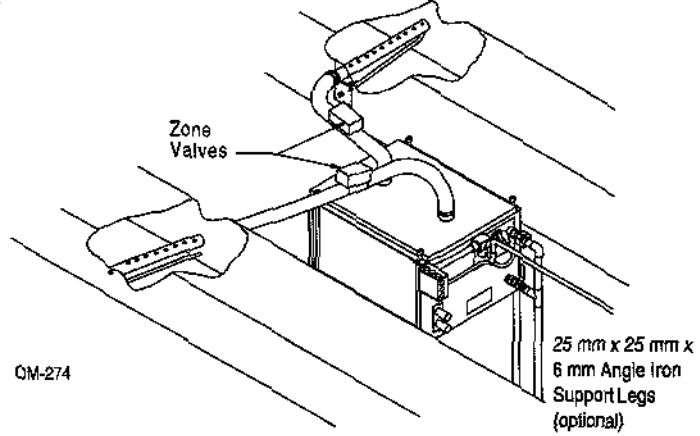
and 9-2: Mounting Units Away from Duct(s) Using Vapor Hose
